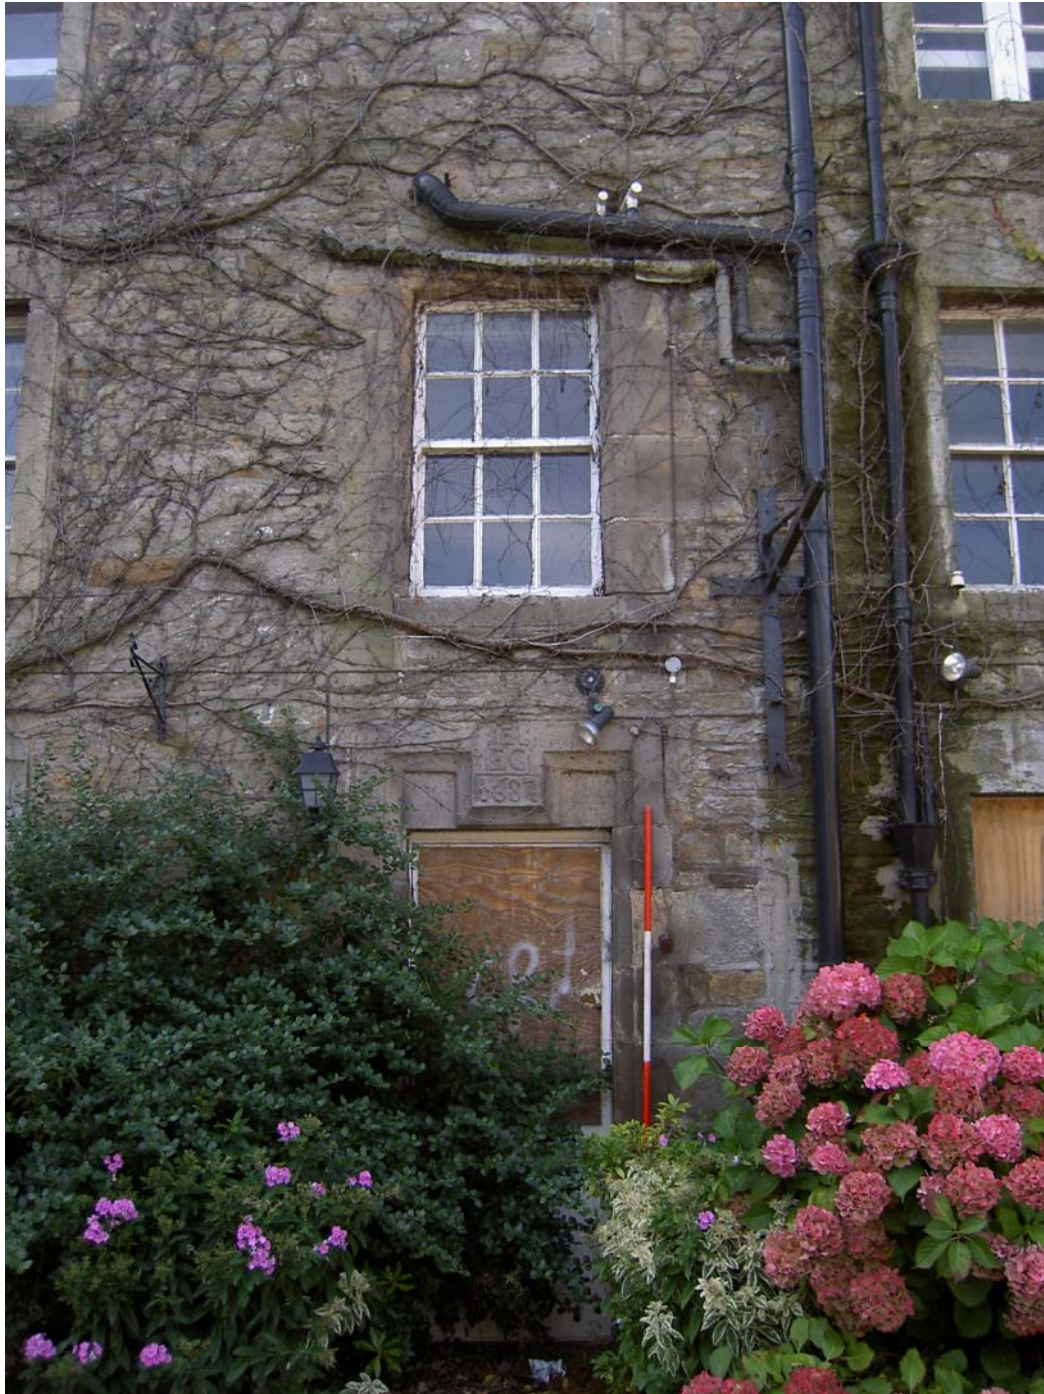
Detail of the central doorway (with datestone of 1687) and modified first floor window, east (front) external elevation of Building 2
